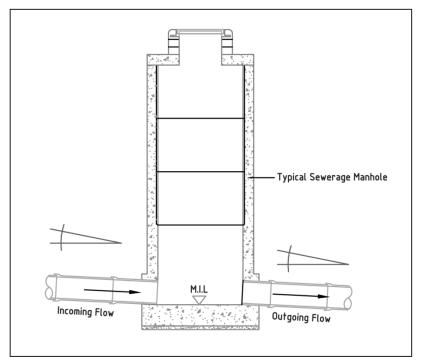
A typical connection for outgoing pipe invert level to match manhole/inspection chamber invert level
